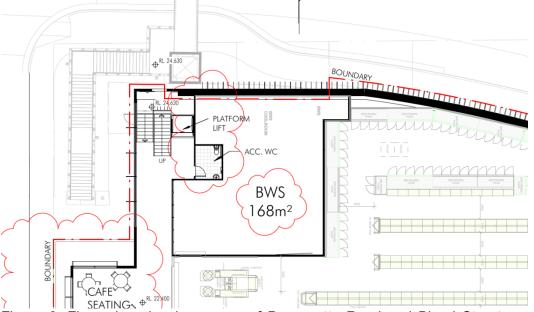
Floor plan showing corner of Parramatta Road and Bland Street as well as the pedestrian bridge.
